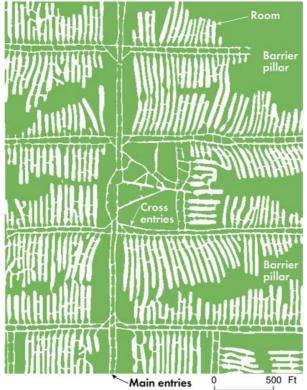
Possible layout of an early room and pillar mine, showing irregular room and pillar sizes.
